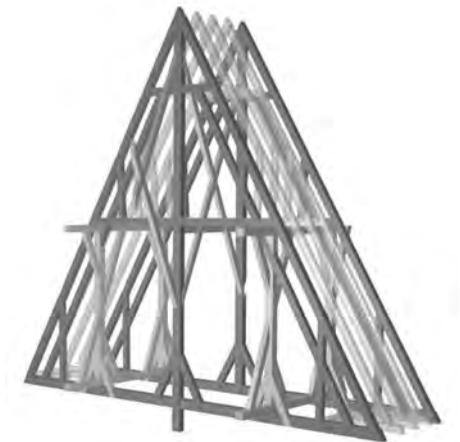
3D architectural model of the medieval roof of the church St. Michael in Vienna; Credit: J. Brunner, B. Ponsold 2012
